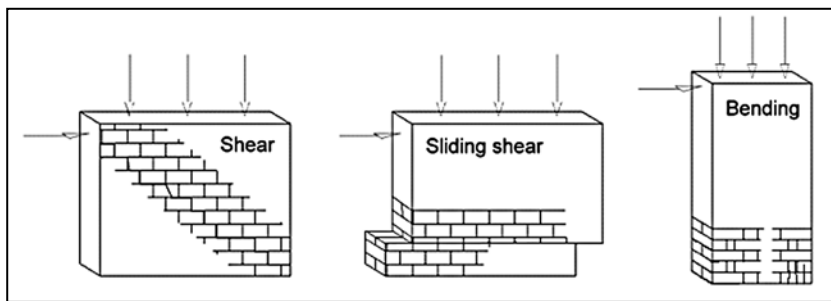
Failure modes for masonry walls subject to in-plane loads
